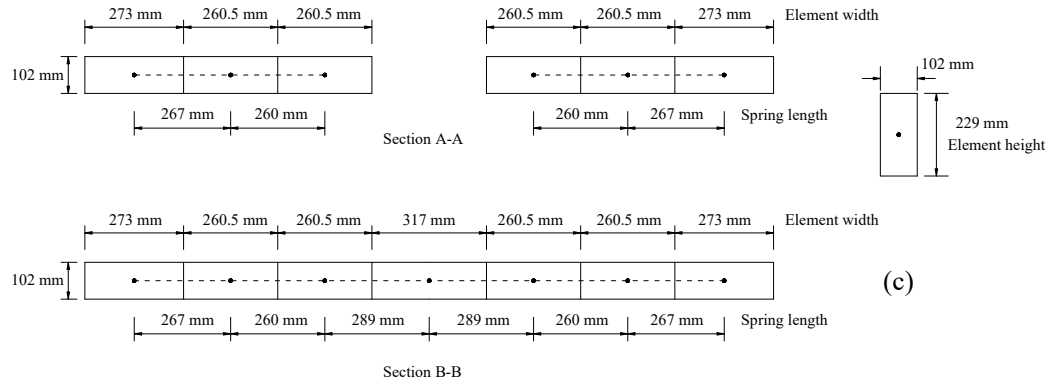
Wall specimen PW1 tested by Shiu et al. (1981)
